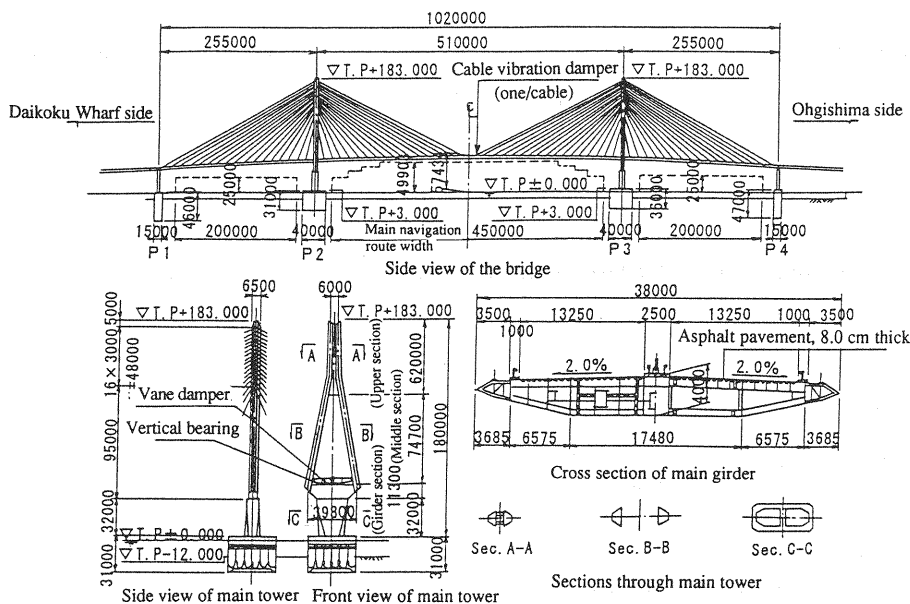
General drawings of the Tsurumi Tsubasa Bridge
